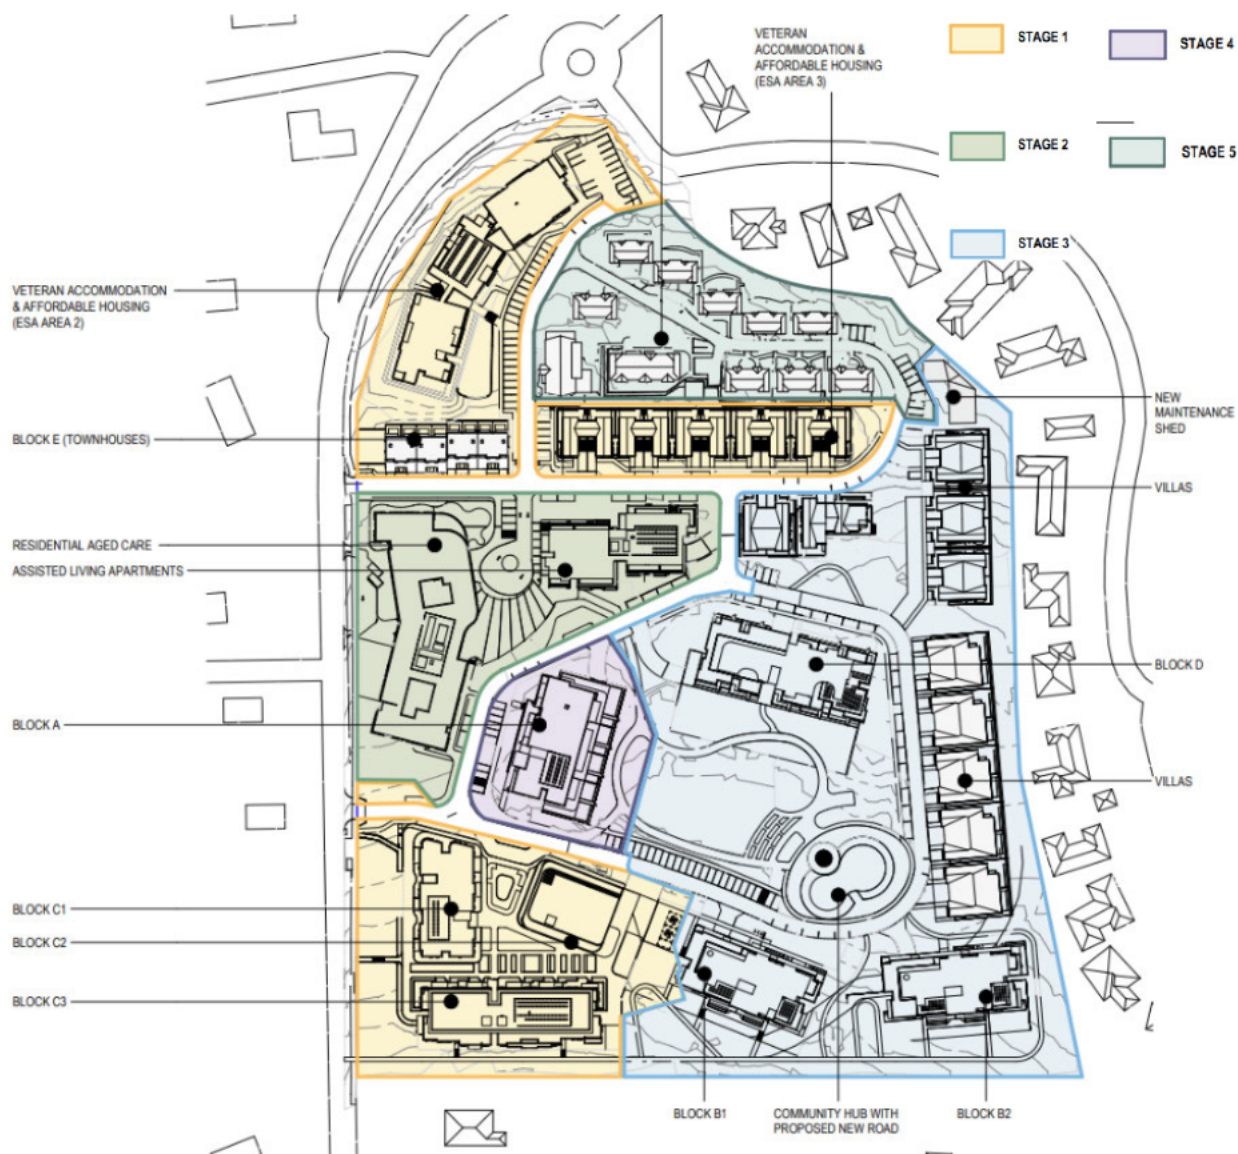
Staging masterplan overview (Source: Masterplan, prepared by Thomson Adsett)
